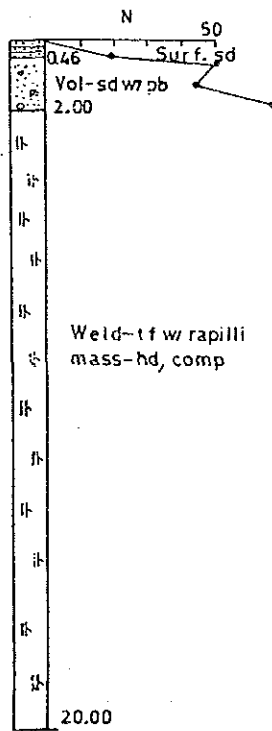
Soil Profile at the El Arroyo Bridge Site on the Managua-Masaya Road
